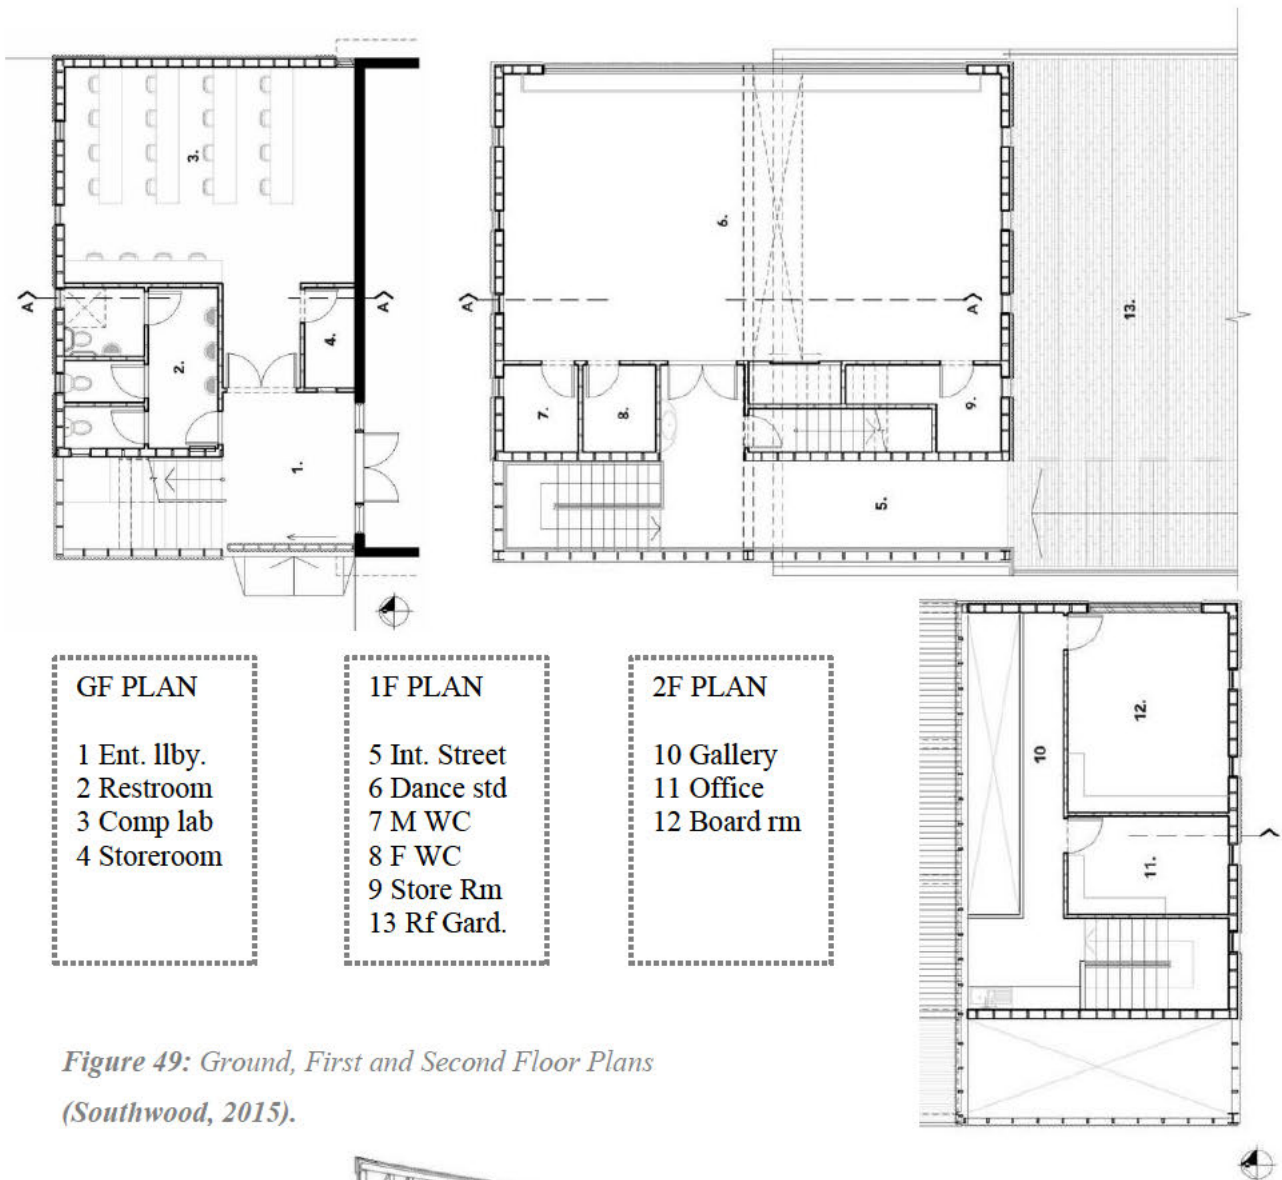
Ground, First and Second Floor Plans (Southwood, 2015).
